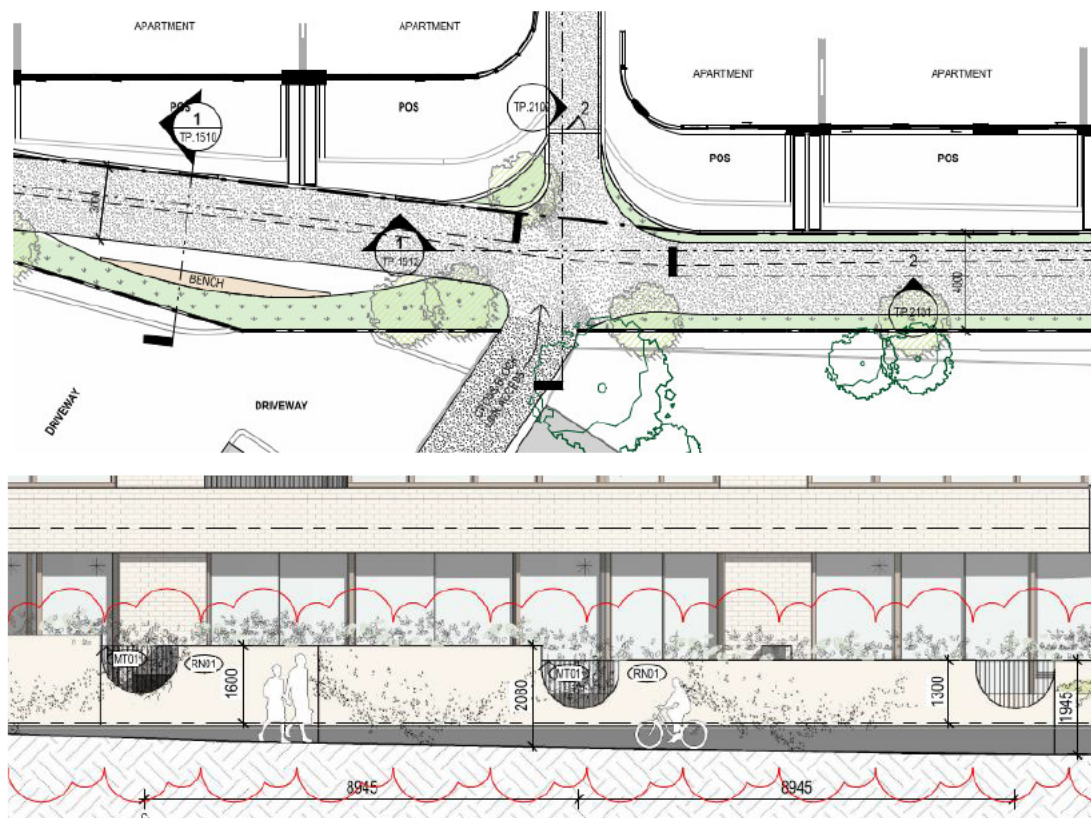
Excerpt of share path plan showing proposed width, landscaping treatment and splayed courtyard fencing where the secondary building entry intersects with the path (top) and the treatment of courtyard fencing abutting the path which staggers in height and includes permeable fencing sections at regular intervals.
